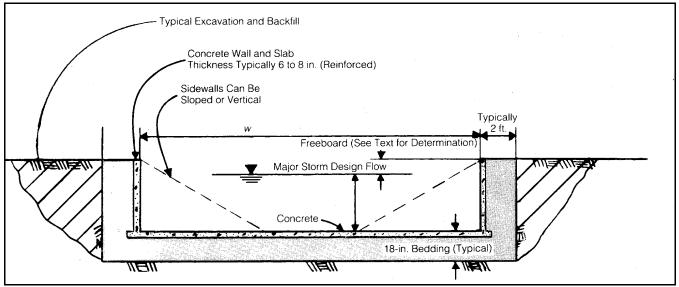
Schematic of channel with concrete lining (Source: ASCE Urban Stormwater Manual)
